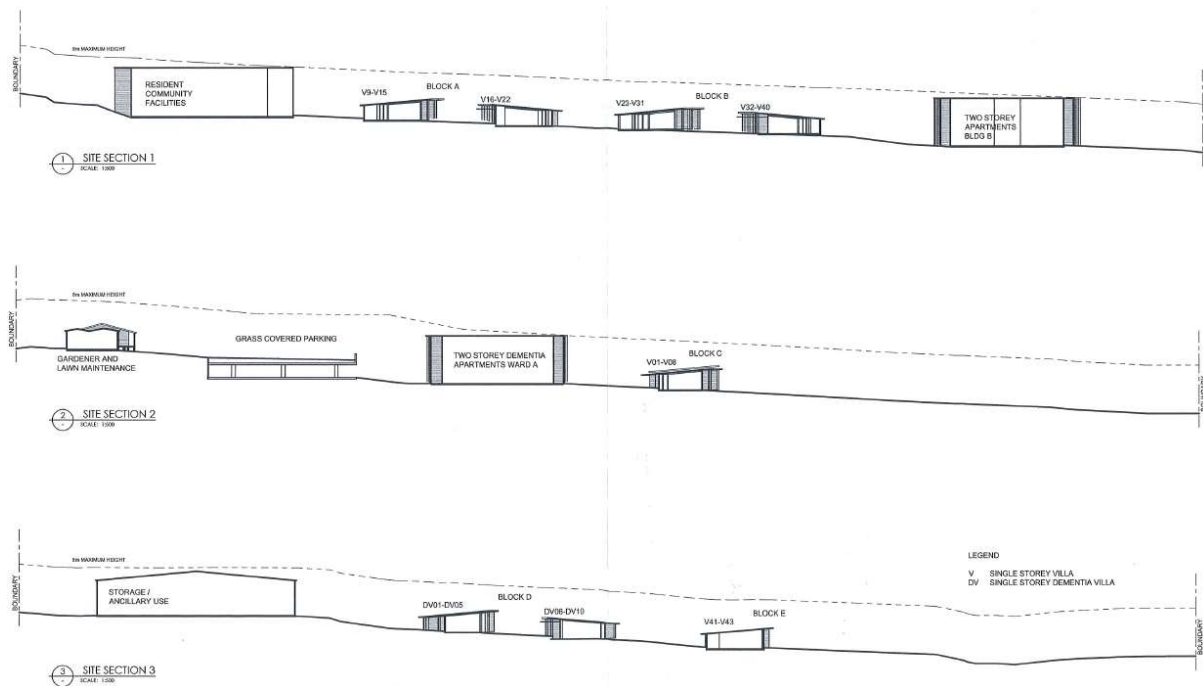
Indicative section plan of scheme (source: Phil O'Donnell Architects).
